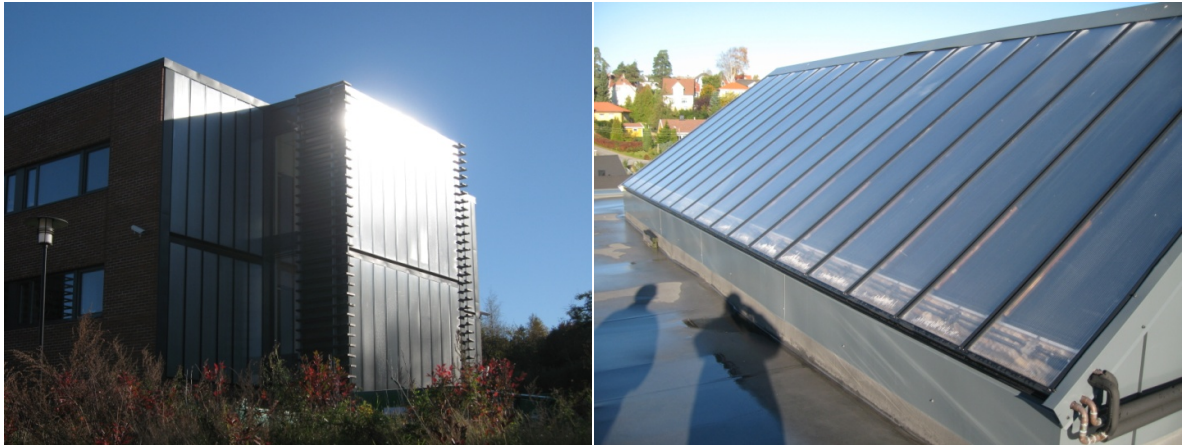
Solar thermal system at south facing facade (left) and on the roof (right) (Bravida office building, Photo: SINTEF Byggforsk)
